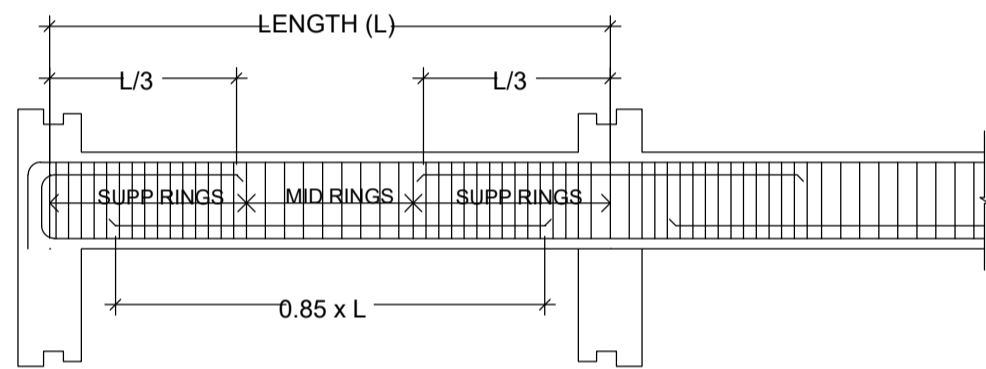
(STANDARD SECTION OF A CONTINUOUS BEAM)
